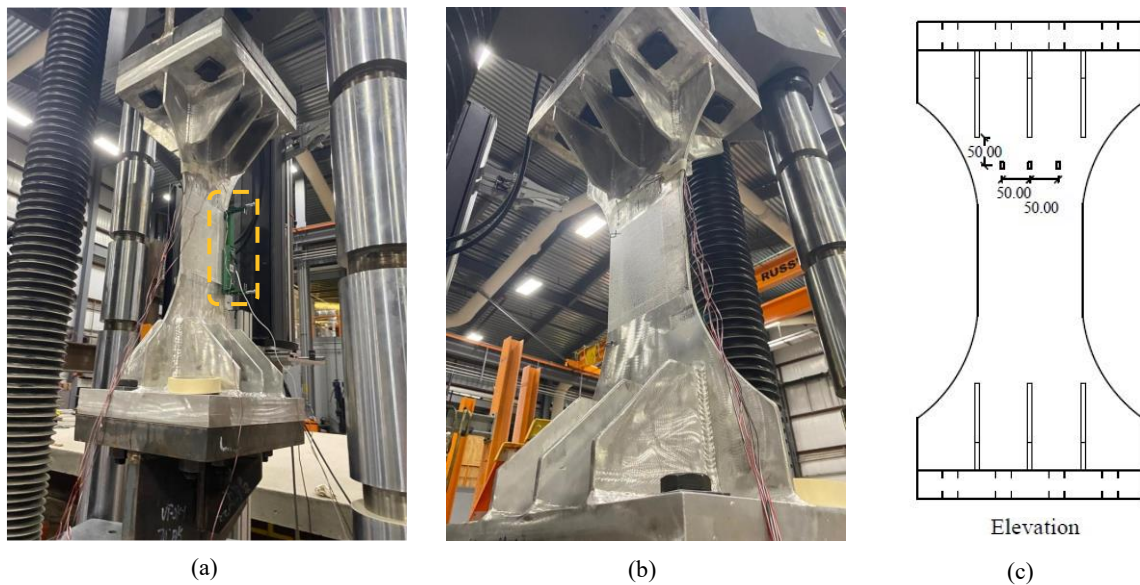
The initial aluminum specimen during testing (a) location of the extensometer, (b) general view, and (c) location of the strain gauges.
